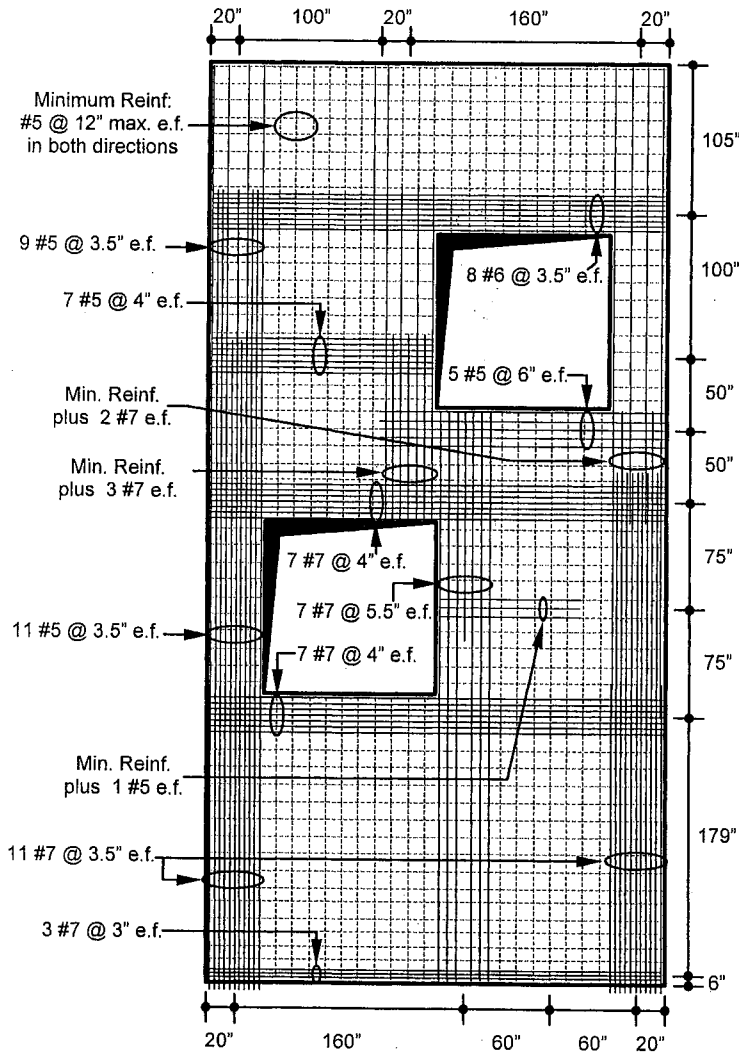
Wall reinforcement configuration (e.f. = each face of wall)
